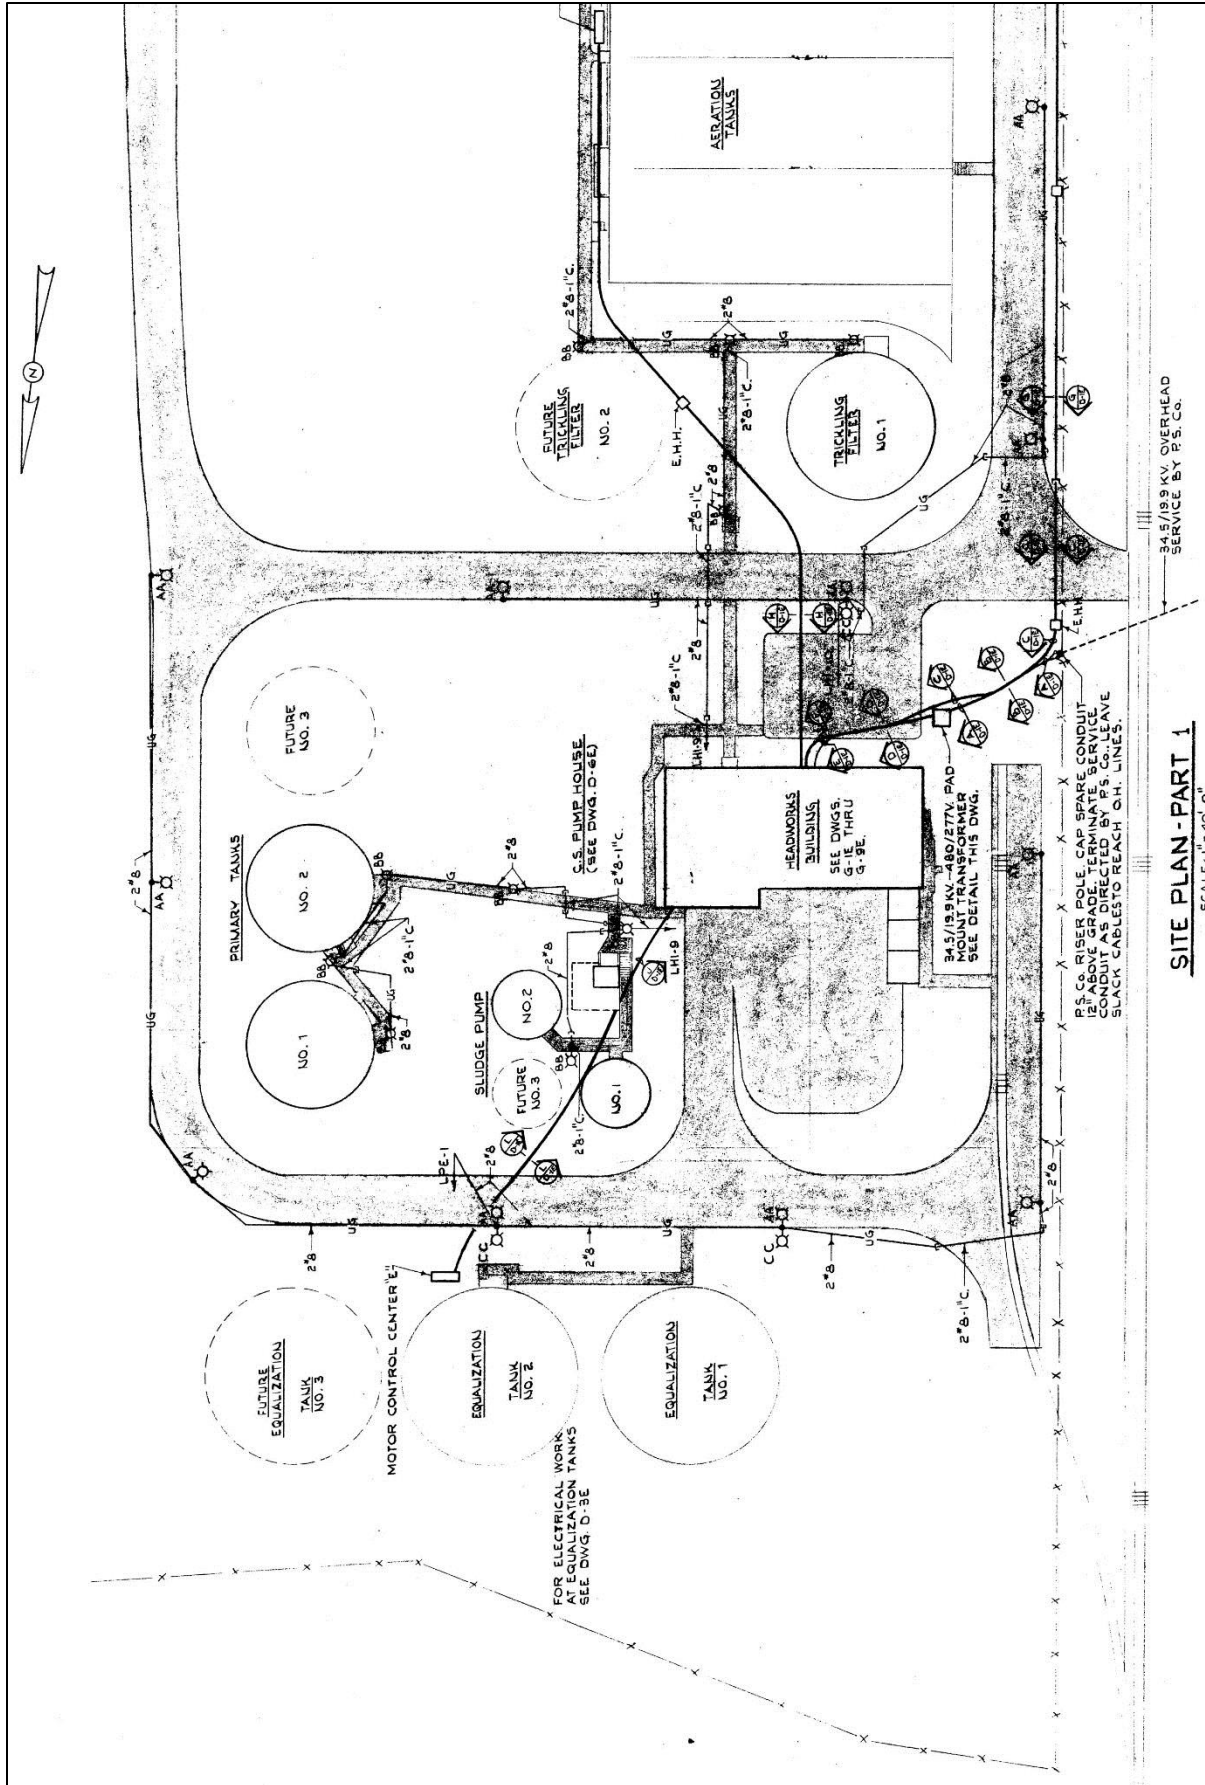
Site plan from Contract 1 Plans, "Sheet D-1E, Site Work – Part 1" [north section]. Anderson-Nichols & Co. Inc., January 31, 1969.
